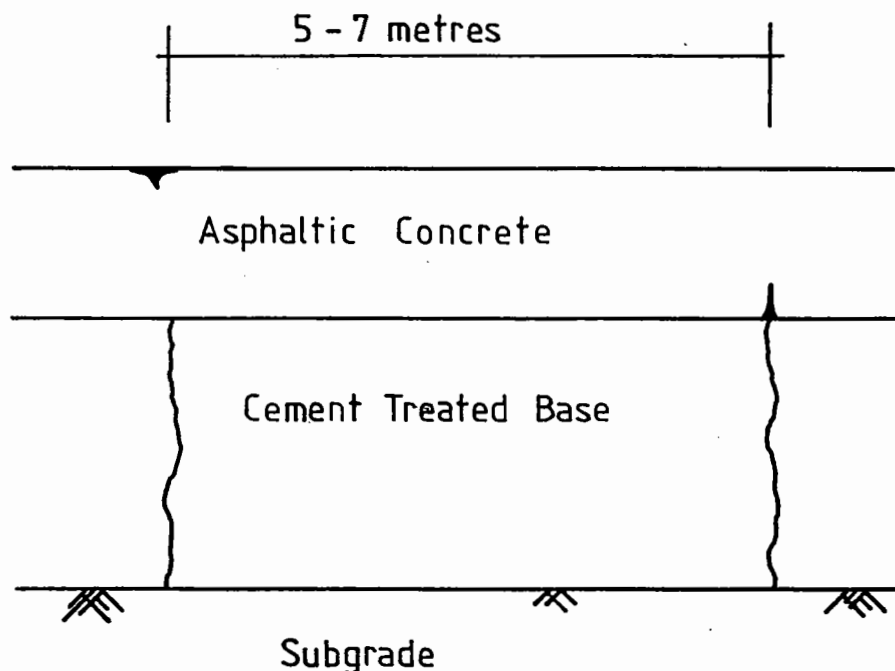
Typical Cross Section of Cement Treated Base Pavement
